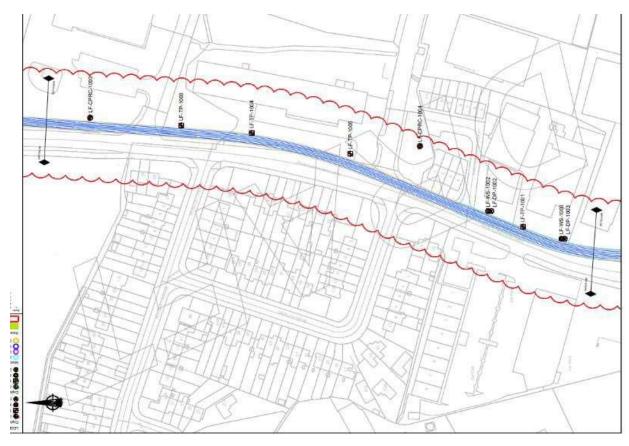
GI Plan Sheet 11, Luas Finglas (Barry Transportation and Eegis).
